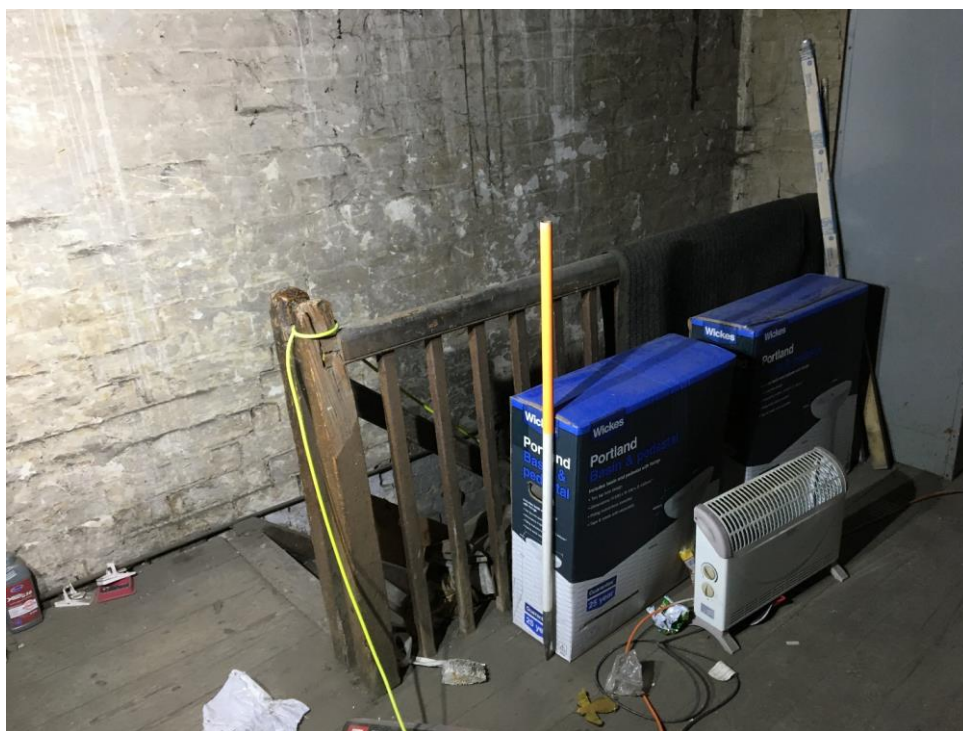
View looking SE showing detail of staircase balusters and newel post on first floor
